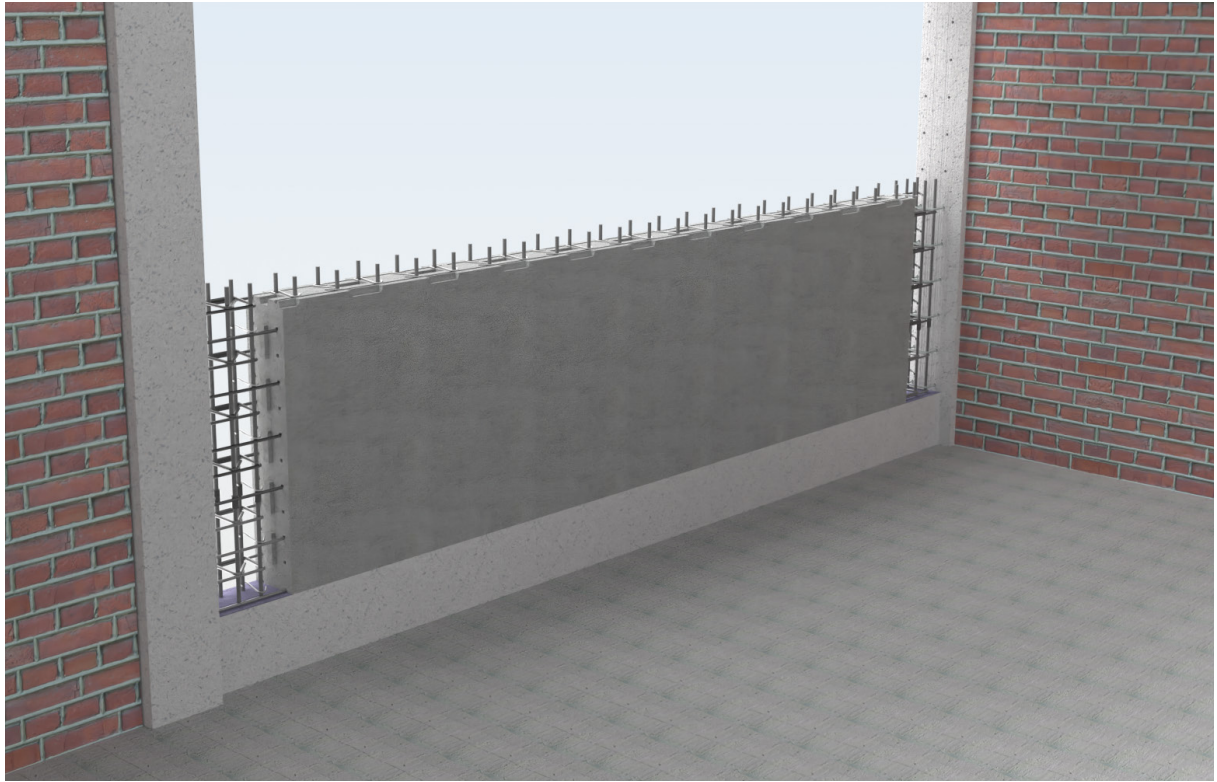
Step 10: After all the rebar elements are prepared and in place, the first row of the bottom bricks (without shear teeth on the bottom) can be slid over the longitudinal rebars.
